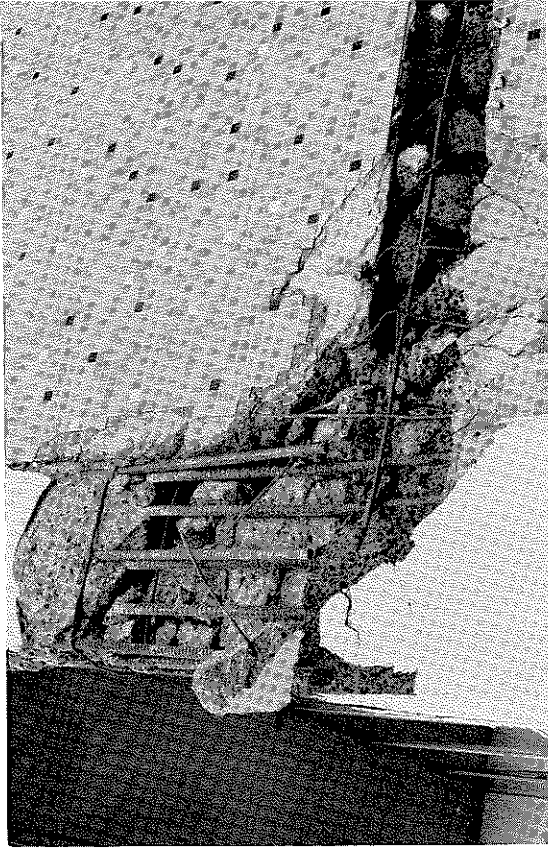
Closeup view of the end wall fracture at the fourth floor construction joint. The distorted vertical reinforcing steel in the wall indicates large movements have taken place. The vertical reinforcing steel in the corner column is lapped at the fourth floor level, and a reduced number of bars are continued above this level.
